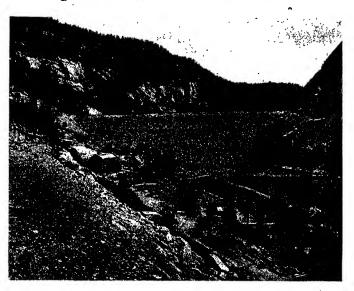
Salt Springs Power House and Downstream Face of Salt Springs Dam
